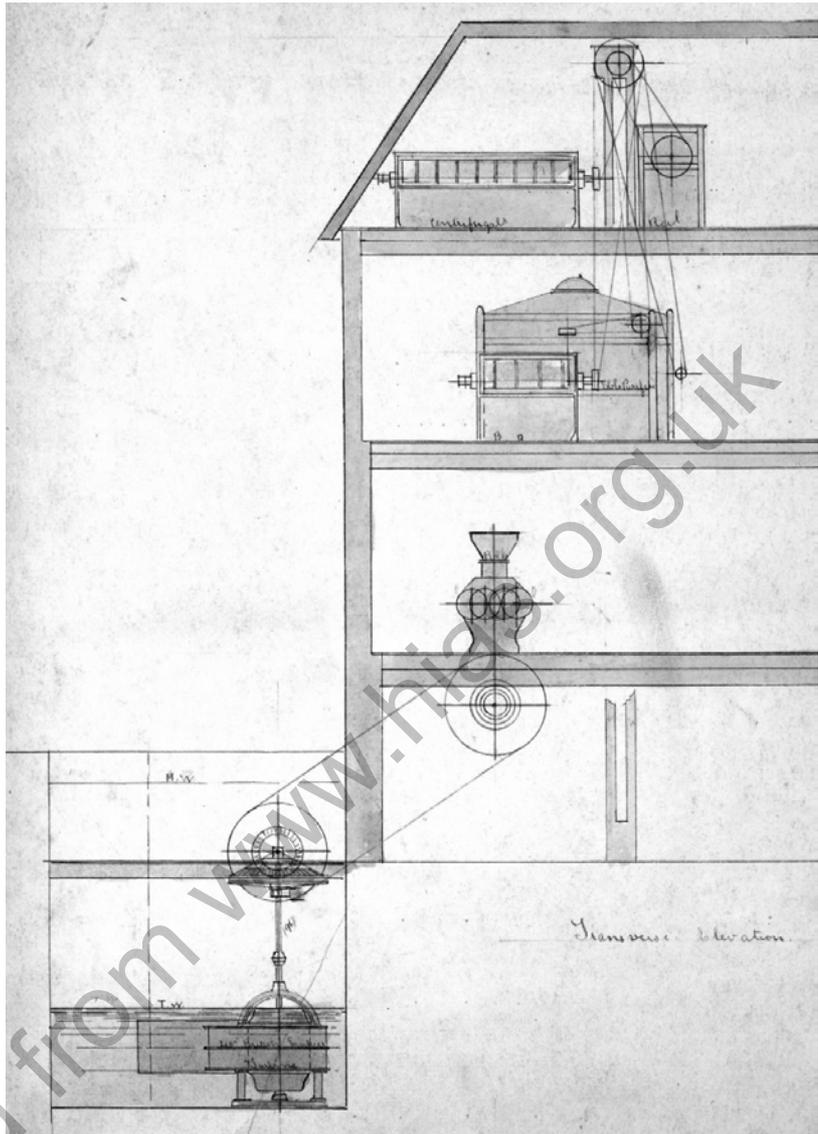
Armfield drawing of Chesapeake Mill, Wickham, showing turbine and drive to mill, but not in the final place as built.
